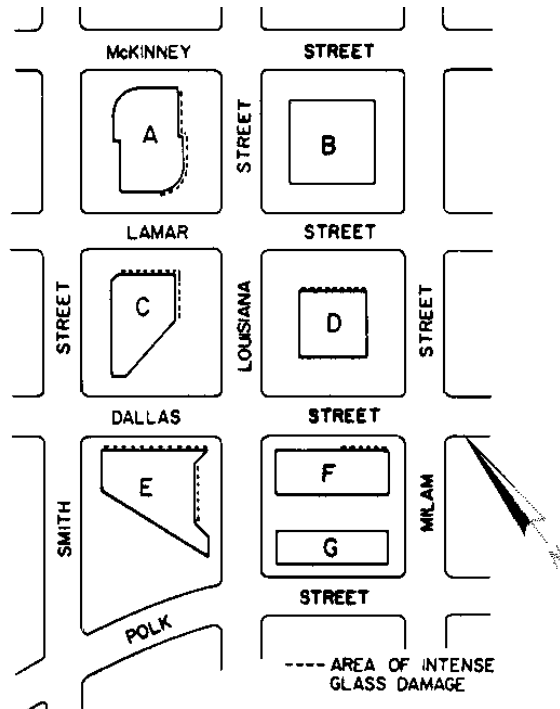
Plan View of Damaged High-Rise Building Towers (Beason et al., 1984)
